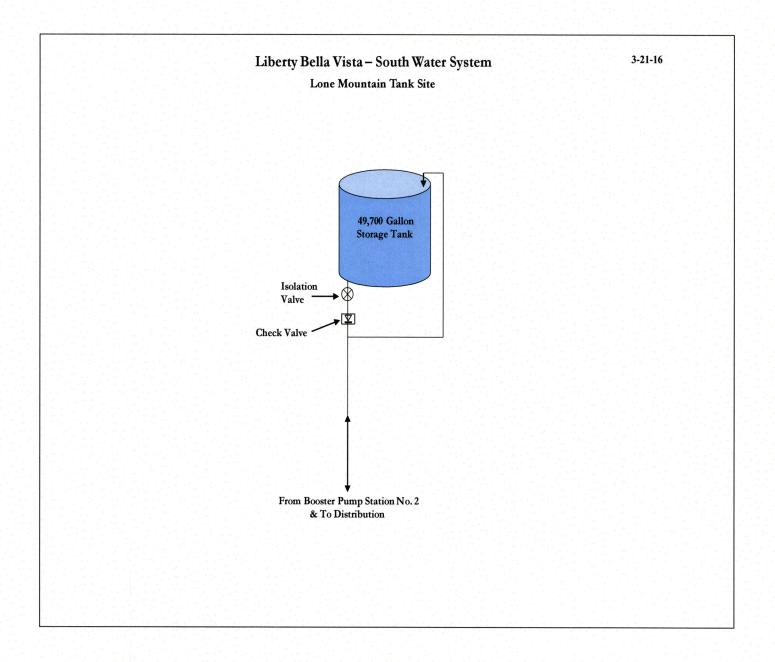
SOUTH WATER SYSTEM LONE MOUNTAIN TANK SITE
